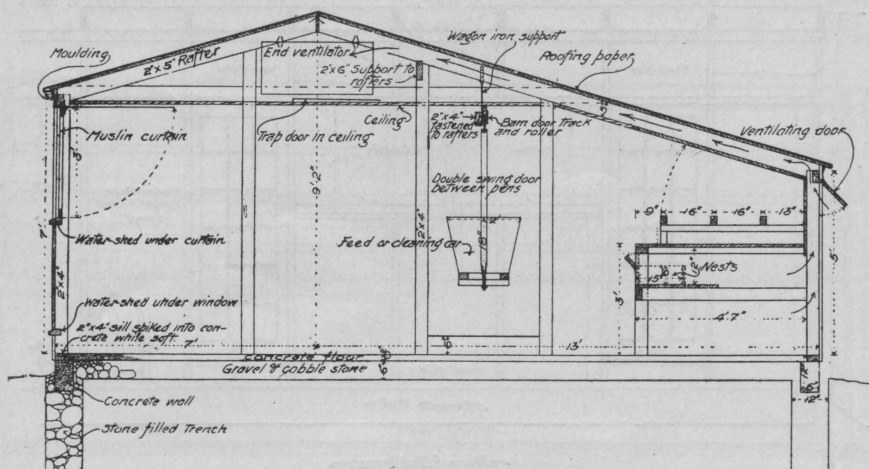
A cross-section plan of a Cornell poultry house with pens 20 feet square, adapted to the combination roof type of construction and interior ceiling
